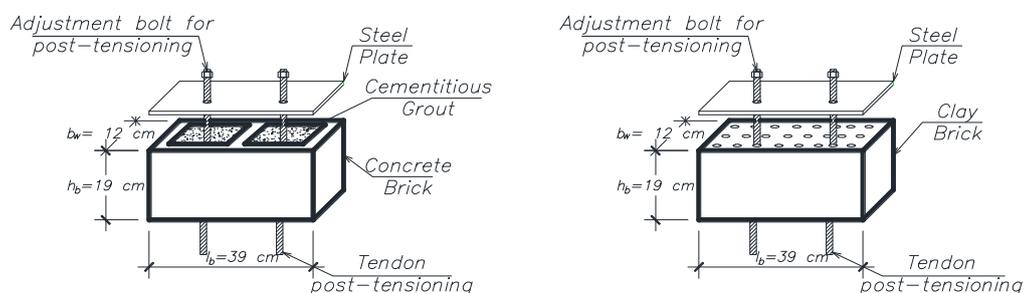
Reinforcement of parapet masonry units with post-tensioning technique
